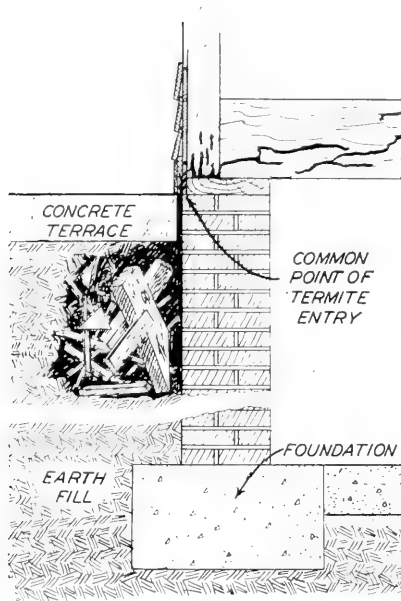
Earth filled terraces are a common source of termite attack. Waste wood covered with soil and kept moist from water seeping through crack at point of union with foundation makes an ideal condition for termites, which attack the superstructure through the same crack as that which supplies the moisture. Conditions shown here should be contrasted with those in fig. 18.
